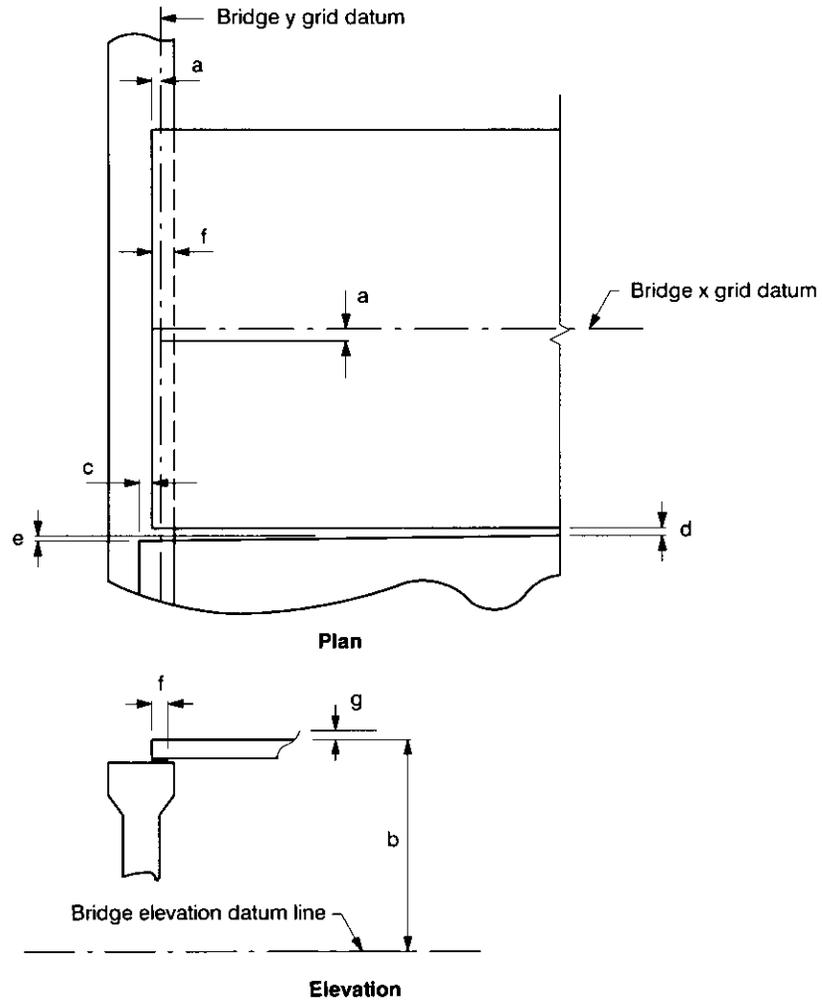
Pier Deck Erection Tolerances
